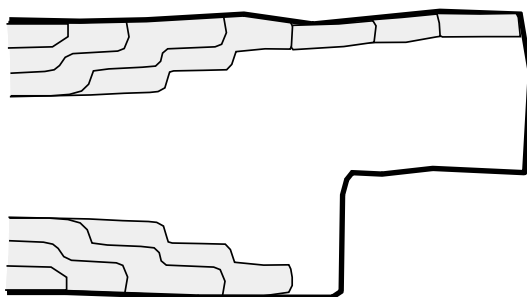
Shotcrete was applied in layers associated with the advances of the tunnel face /Brantmark, 1997/.
